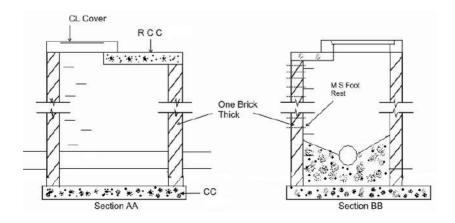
Rectangular manhole for depth 0.9 m to 2.5 m
